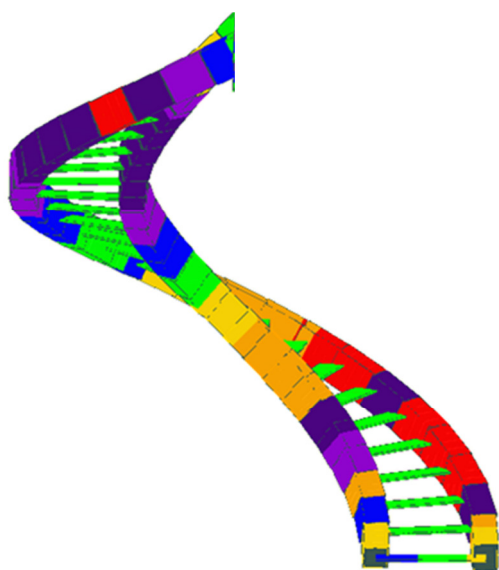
3D image feature stair – from GSA Structural Design Model
